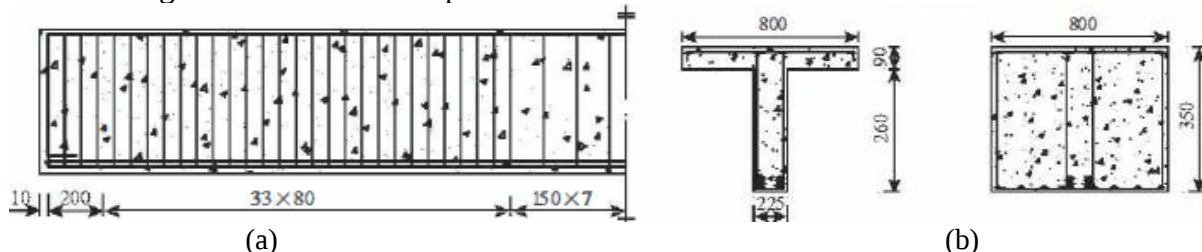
Sectional views of girder [49] [(a): longitudinal span, (b): transverse view]
